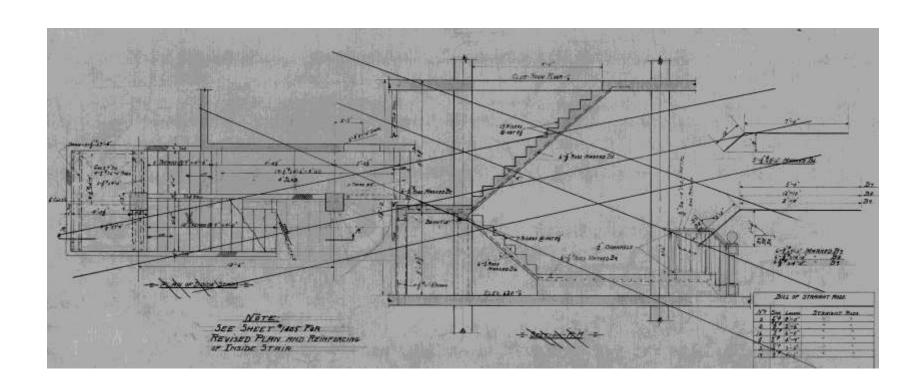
Stair details from *Pumping Station Pedestal and Inside Stair Details* (AES, Drawing No. 5322, 29 June 1920). As originally designed, the stairs began at the Entertainment Level from the east end of the stair opening, integrated a landing into its design, and had a short run of curved steps at the base.
